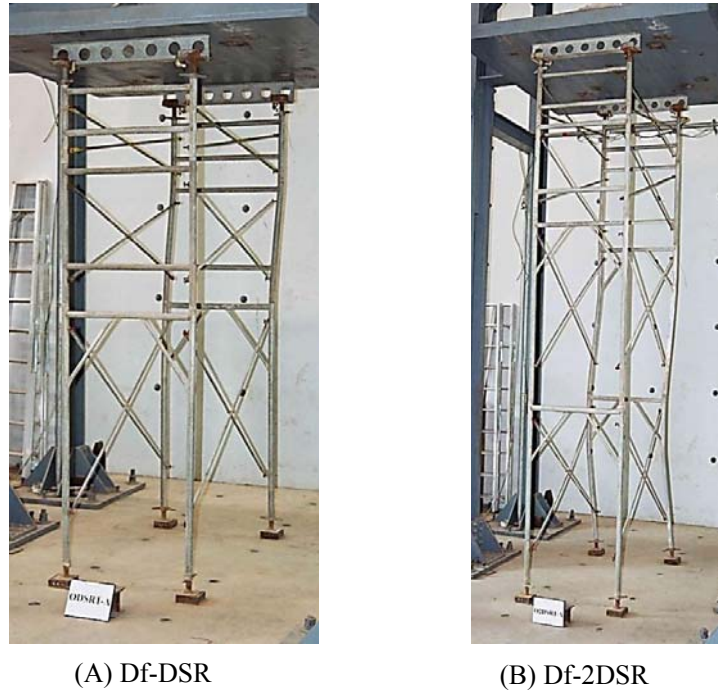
Failure Modes of One-bay Df-DSR and Df-2DSR Setups with Defects
